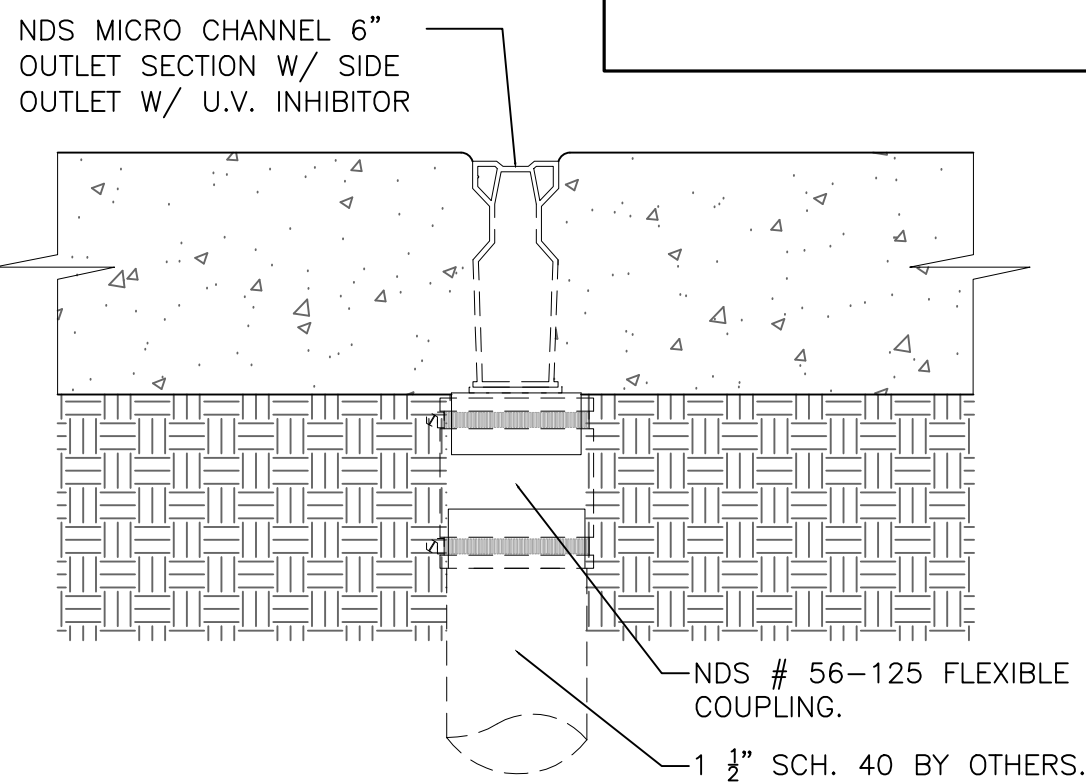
CONCRETE "V"-DRAIN N.T.S.
